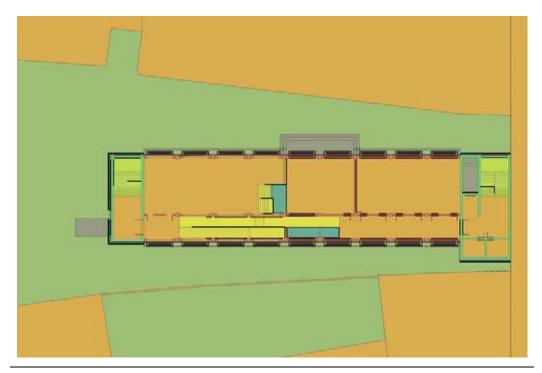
site plane and interior plane of first floor -- upper orientation is northern side
